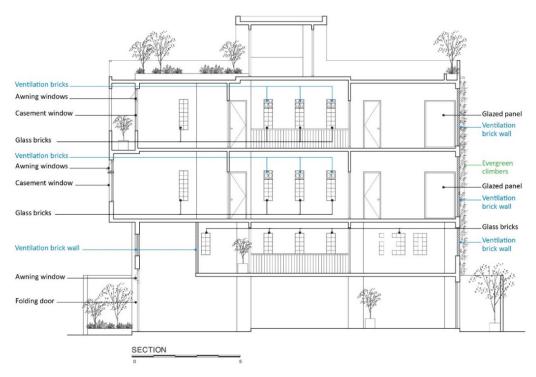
Building elements for passive designs in the house A2 (Section A)
